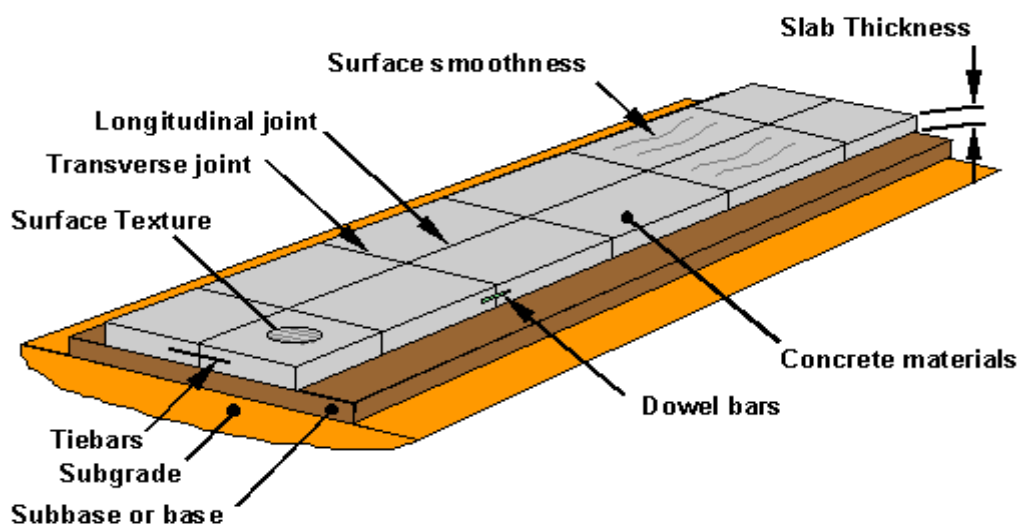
Basic component of a concrete pavement (ACPA 2005)
